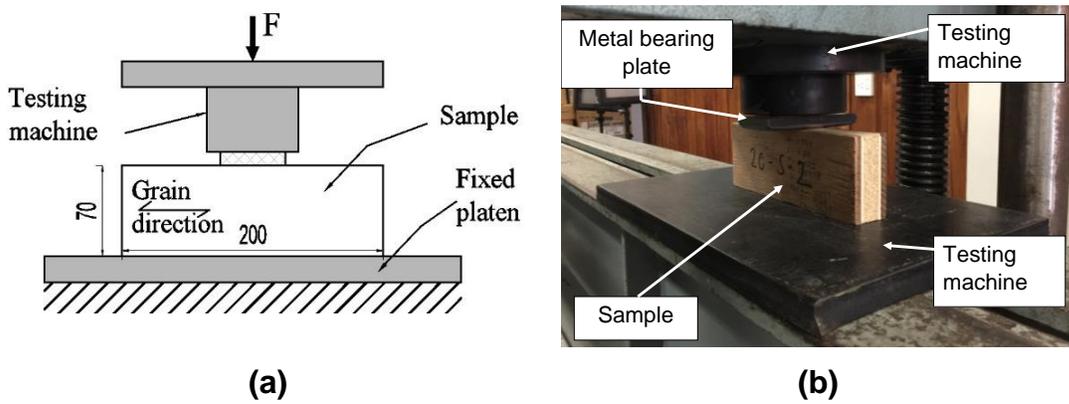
Bearing perpendicular to grain test set-up, (a) schematic and (b) photo
